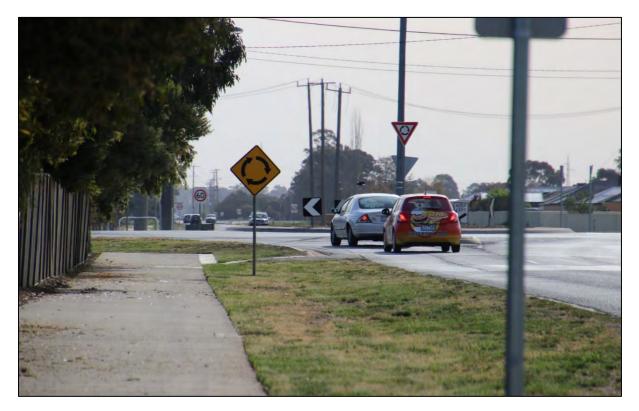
Ford Road facing west on the approach to the Verney Road roundabout.
